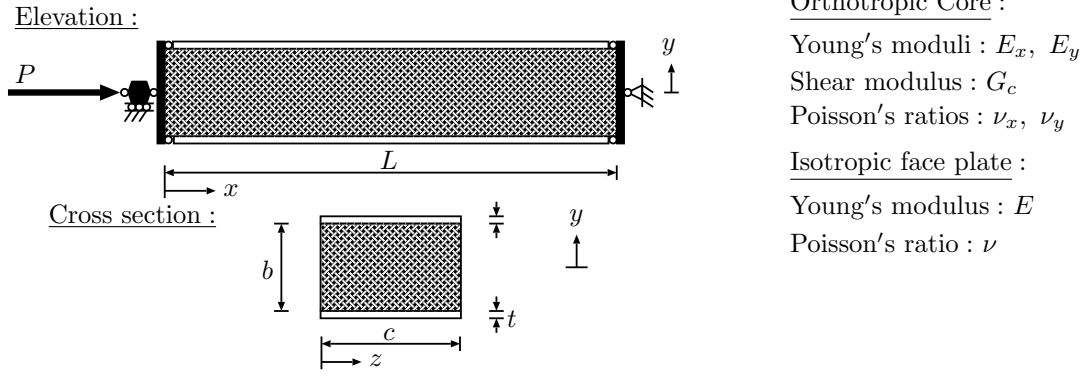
Sandwich panel loading configuration, cross-section and material properties.
